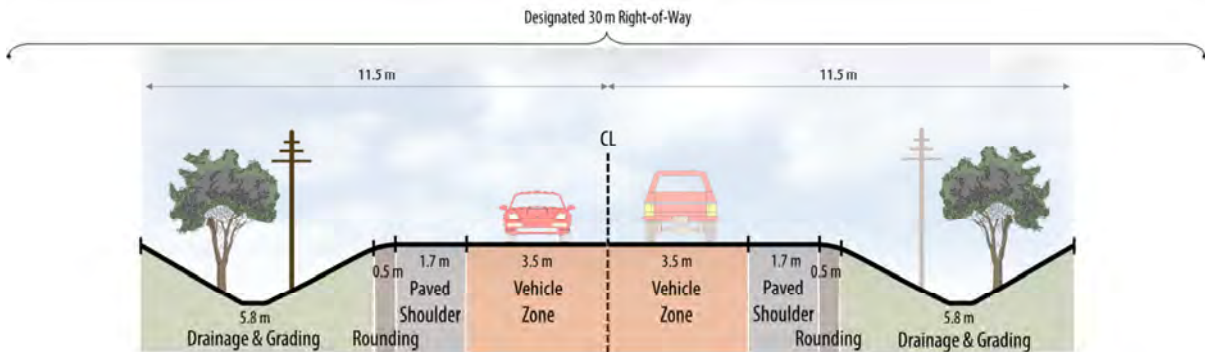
11.4 m Platform Rural Cross-Section for Winston Churchill Boulevard
